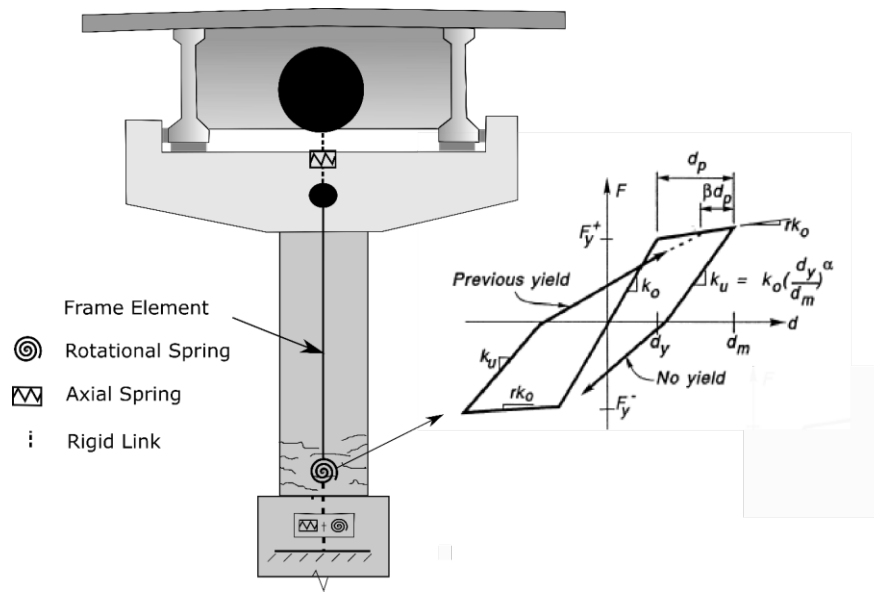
Typical SDOF system layout for pier with bearings and soil stiffness included.
